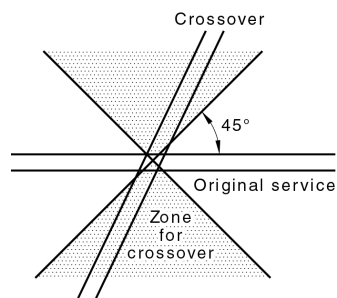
Crossover zone for electrical cables and gas pipes
